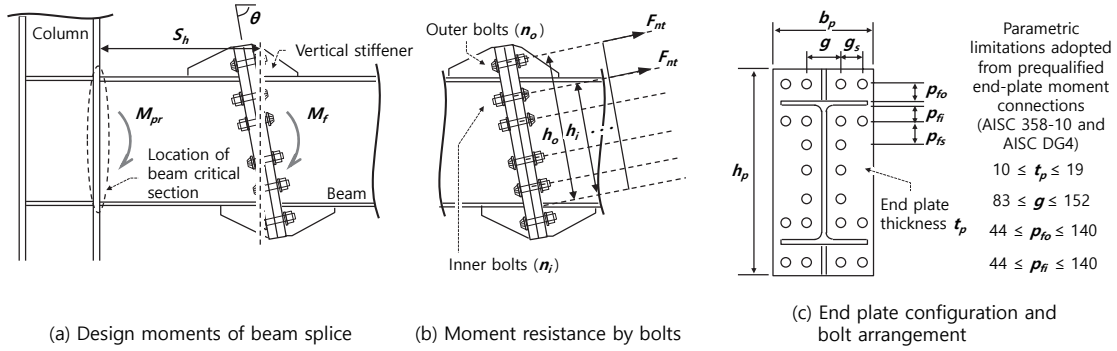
Beam-to-column moment connection with inclined end-plate beam splice
